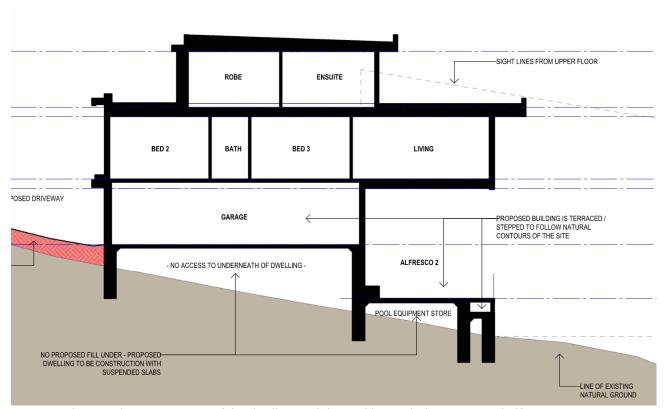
showing the cross section of the dwelling and the void beneath the garage and Alfresco 2.
